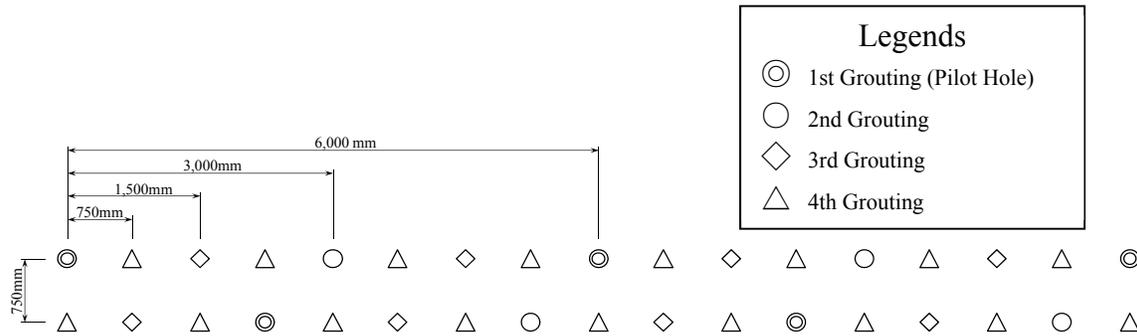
Ap1 Shutoff Curtain Grouting Layout
